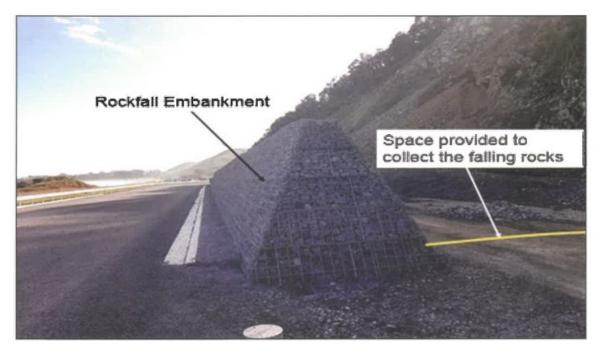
Rockfall Embankment to protect infrastructure and roads at the foot of cliff
